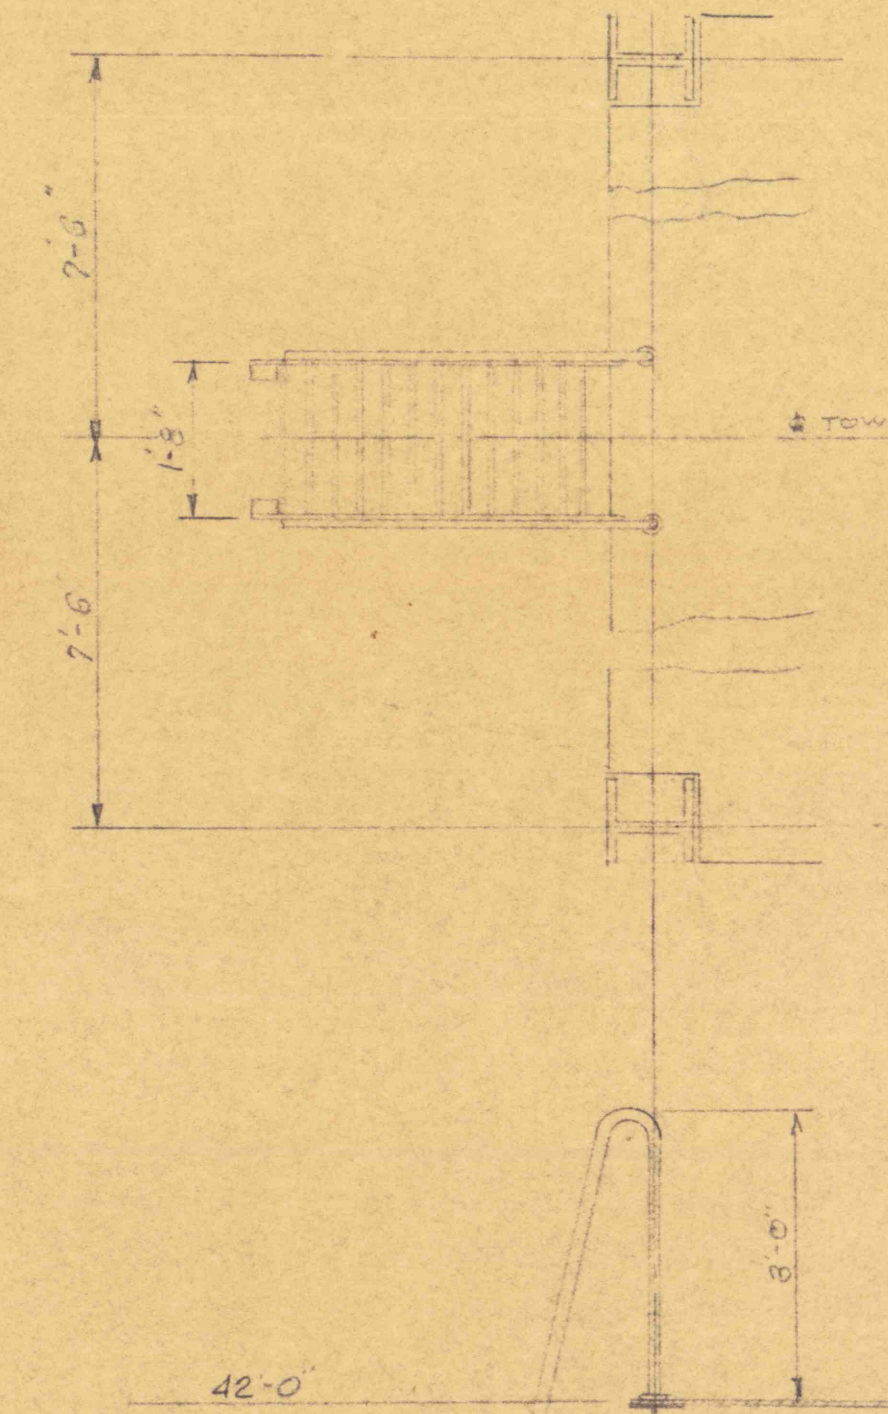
DETAIL 'E' LADDER ELEV. 0'-0" TO 42'-0"
